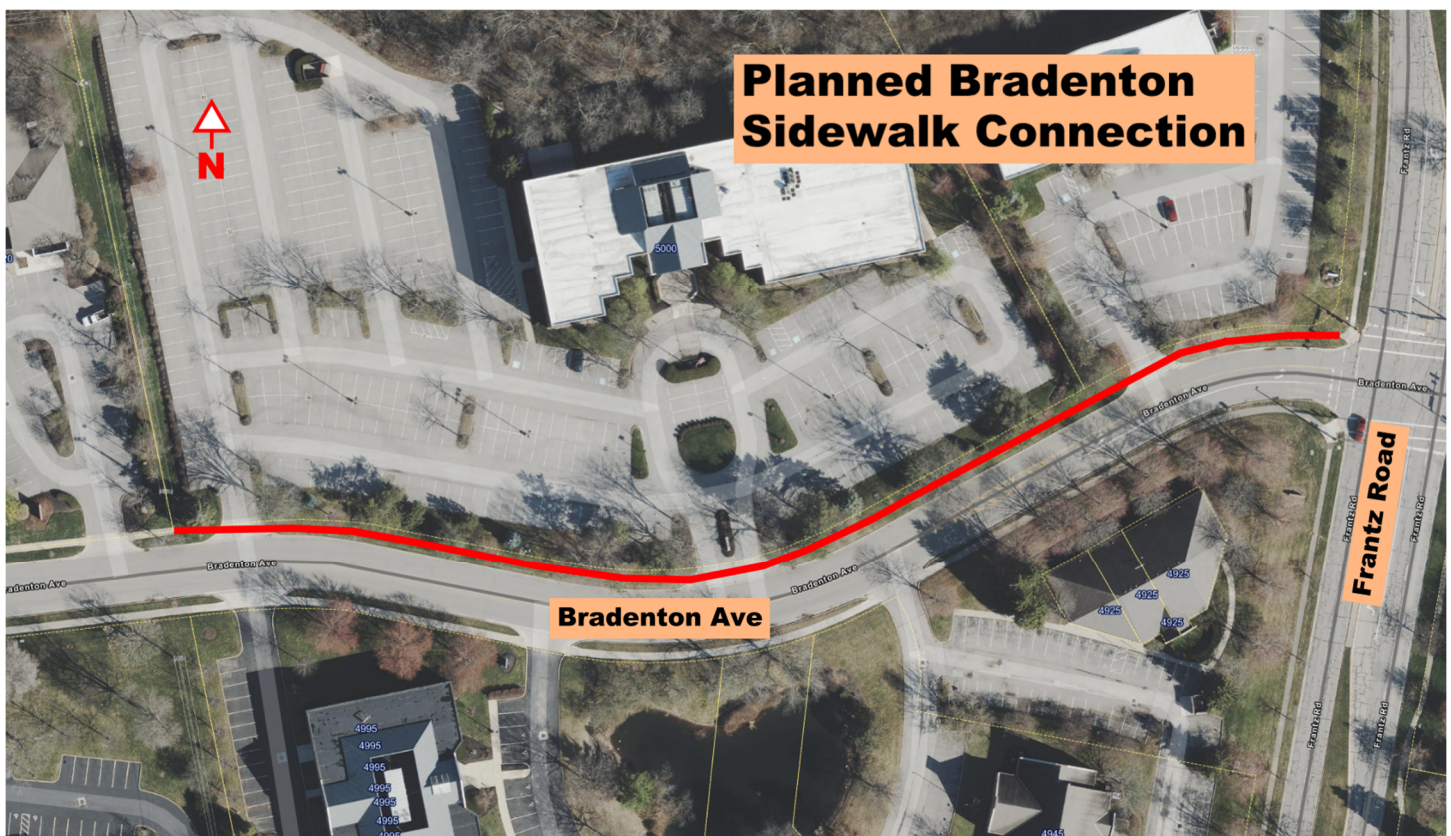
Planned Bradenton Sidewalk Connection Approximate Limits
